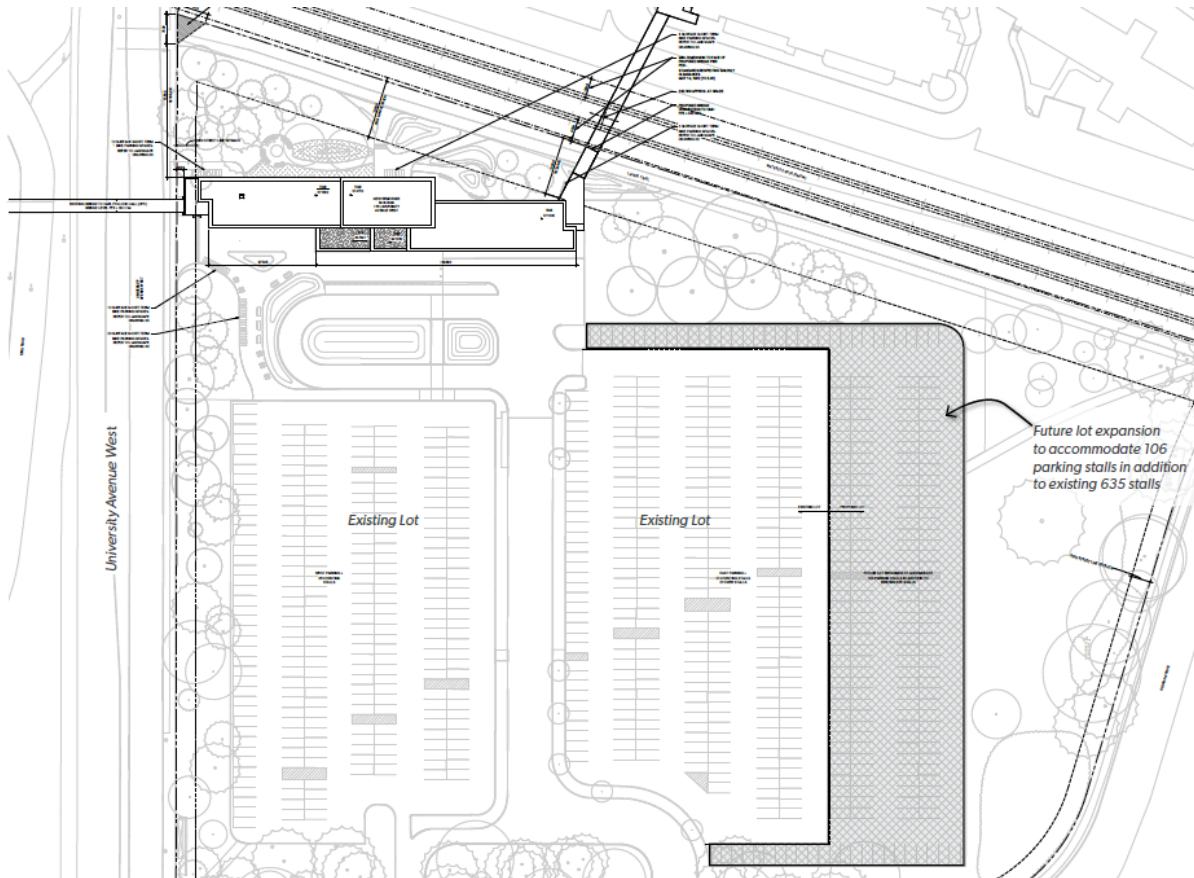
Proposed Parking Diagram - 155 Lands (as submitted by Applicant)
